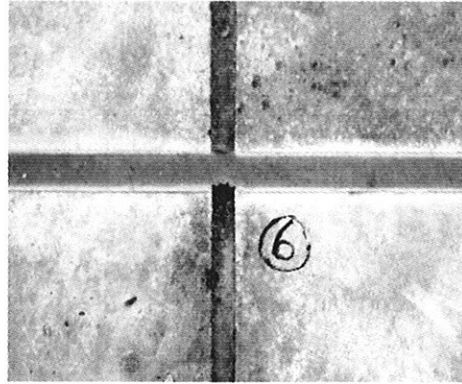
Expansion joints, Roof of coffin crematorium building (Sample No.B/261/06/6)
